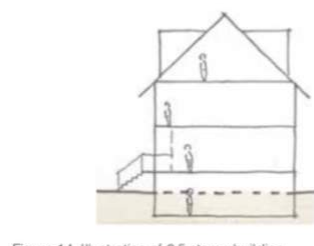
Illustration of 2.5 story building above a basement. (See policy 6.6.1 b).
